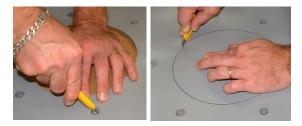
Cutting the bond-layer membrane to size over the roof inlet
